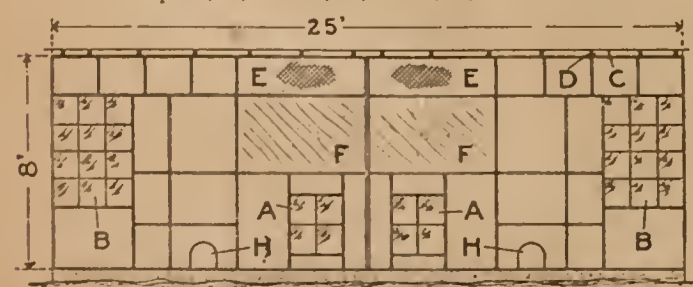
Front view: A, glass windows; B, large windows; C, roof boards; D, rafters; E, openings covered by wire netting; F, large opening covered with muslin; H, chicken exits
